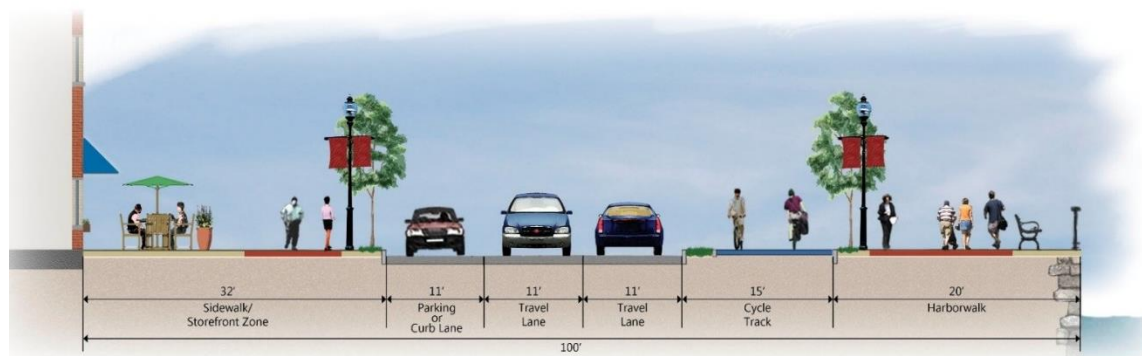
Proposed Dorchester Avenue Cross-Section Looking Northeast
